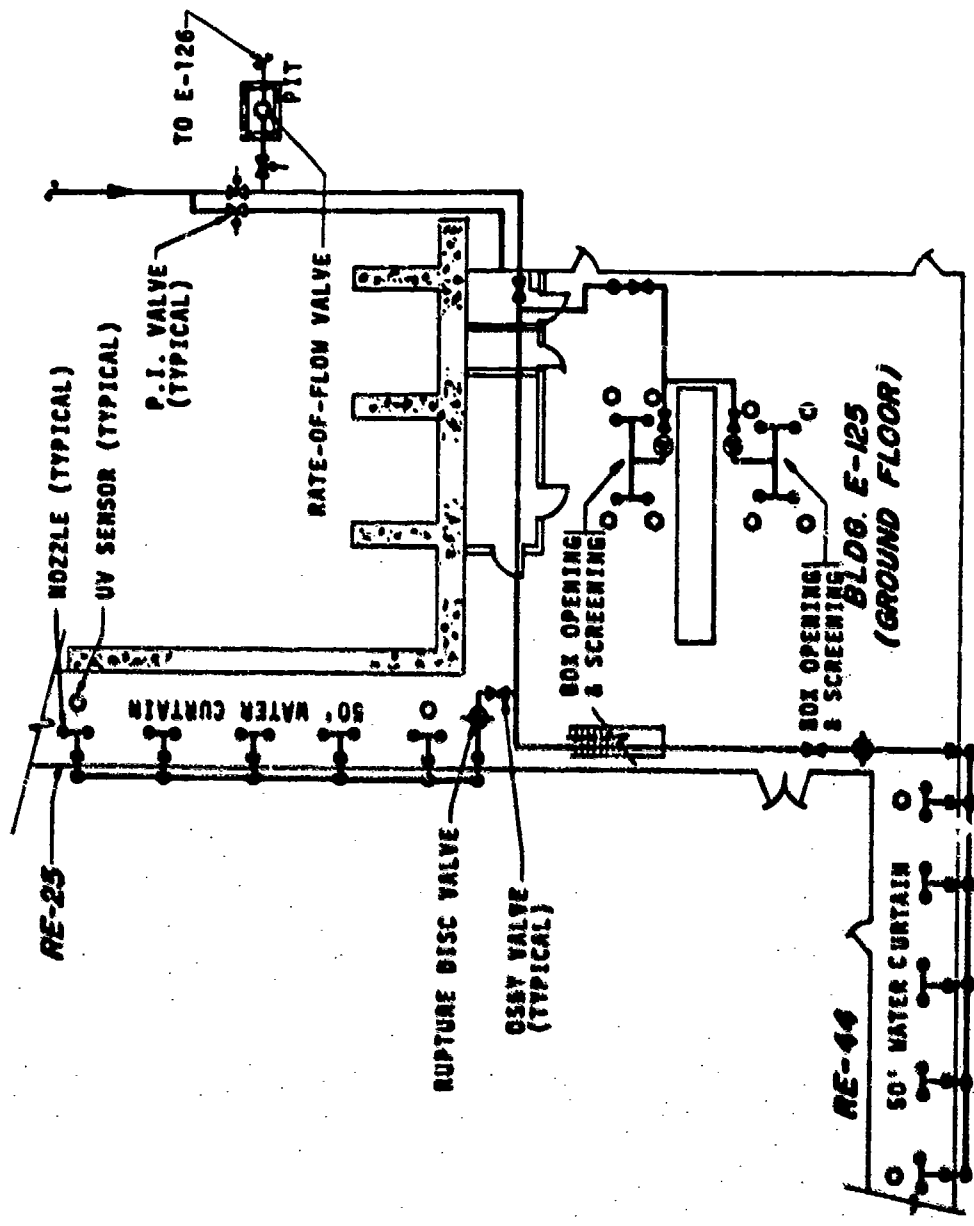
Schematic - building E-125 (ground floor) and ramps RE-25 and RE-44
